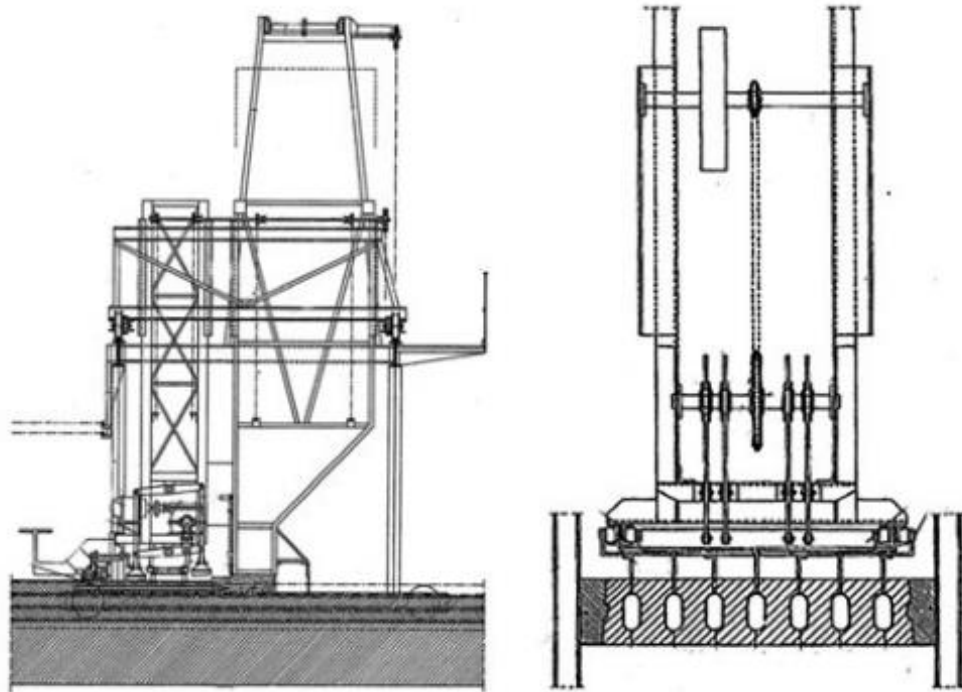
Casting Machine Hanging in a Movable Portal Frame Invented by Schafer
